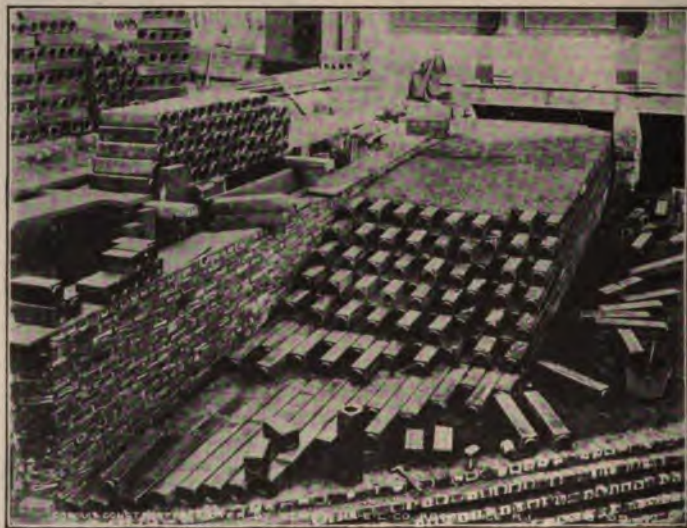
CONDUIT CONSTRUCTION OUTSIDE OF BATTERY STATION
